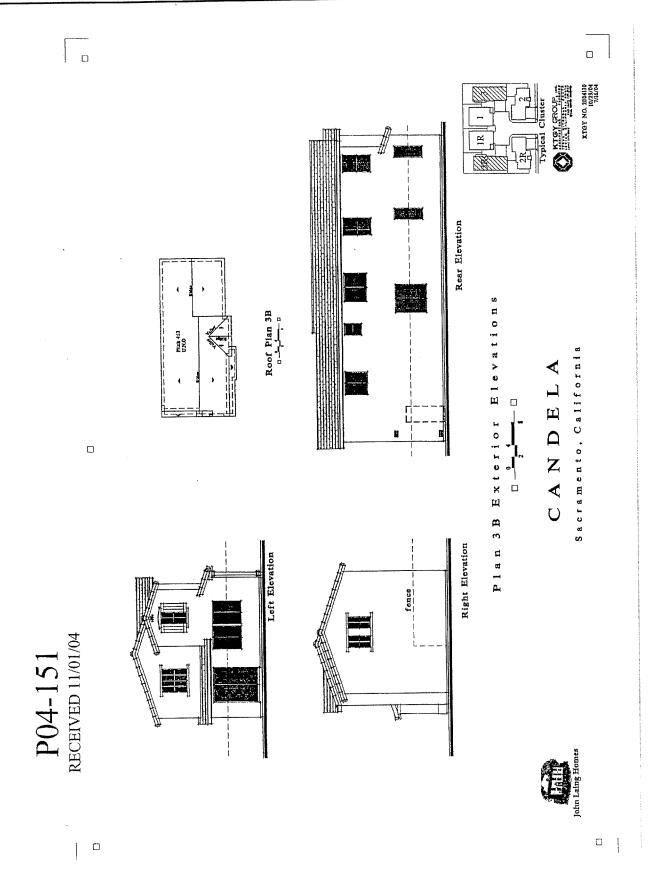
M - Plan 3 - Floor Plans and Elevations
